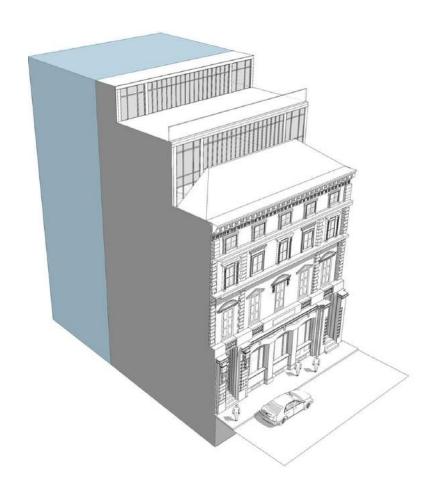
Eight storey extension to rear, built adjacent to existing building
